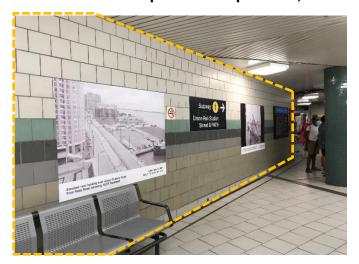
Approximate area of intervention on west wall of existing streetcar loop
